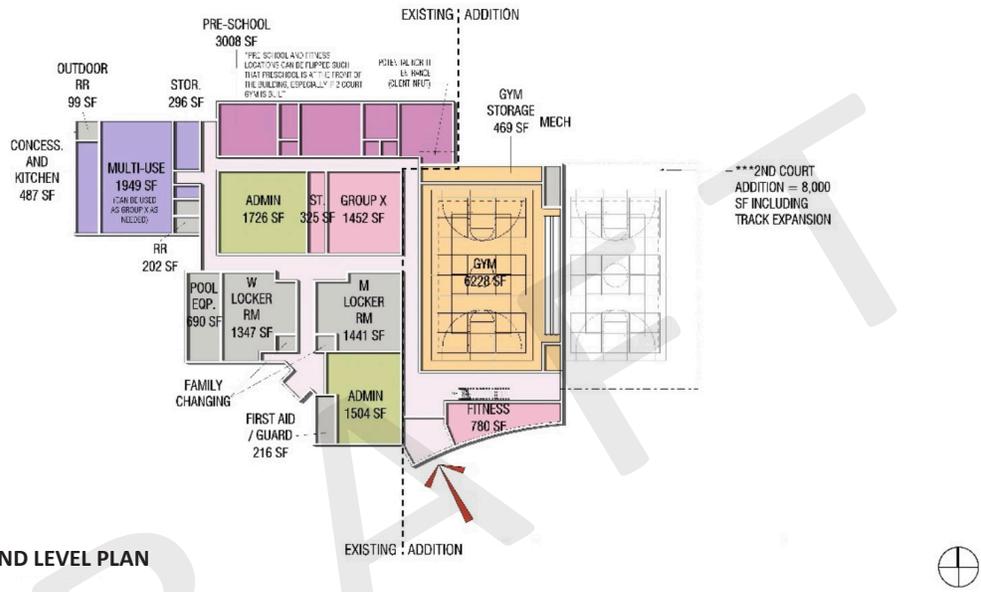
shows the potential second floor plan for the renovation resulting in a 37,000 sq. ft. facility.
